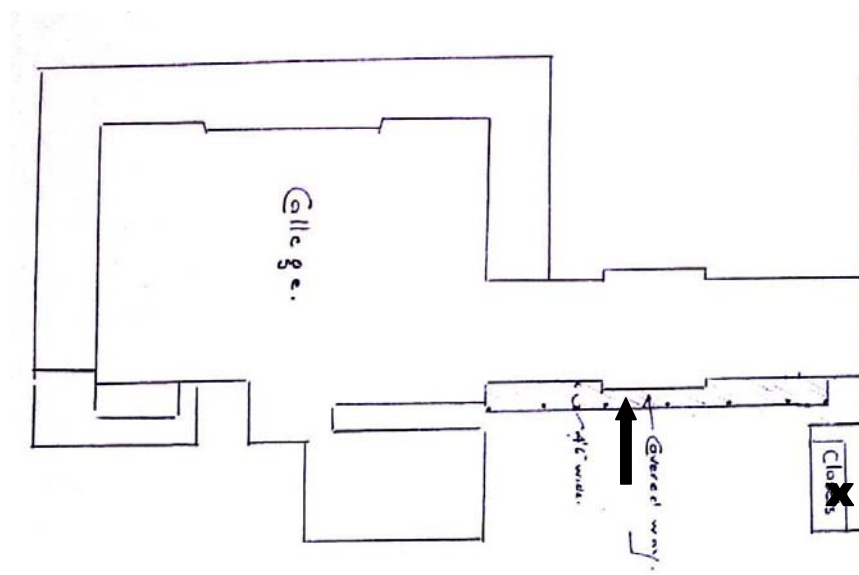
Undated plan of the proposed covered way (arrowed black) linking the college with the women's toilets ((black cross)). Source: State Archives files.
